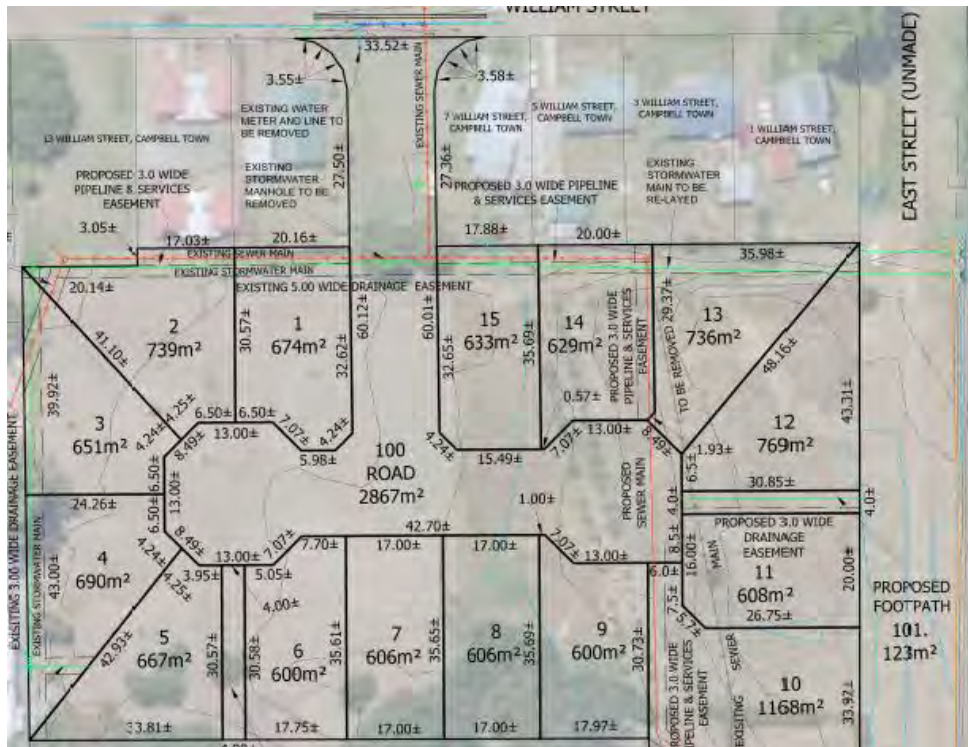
Proposed subdivision layout. Refer to Annexure 2 for detail.
